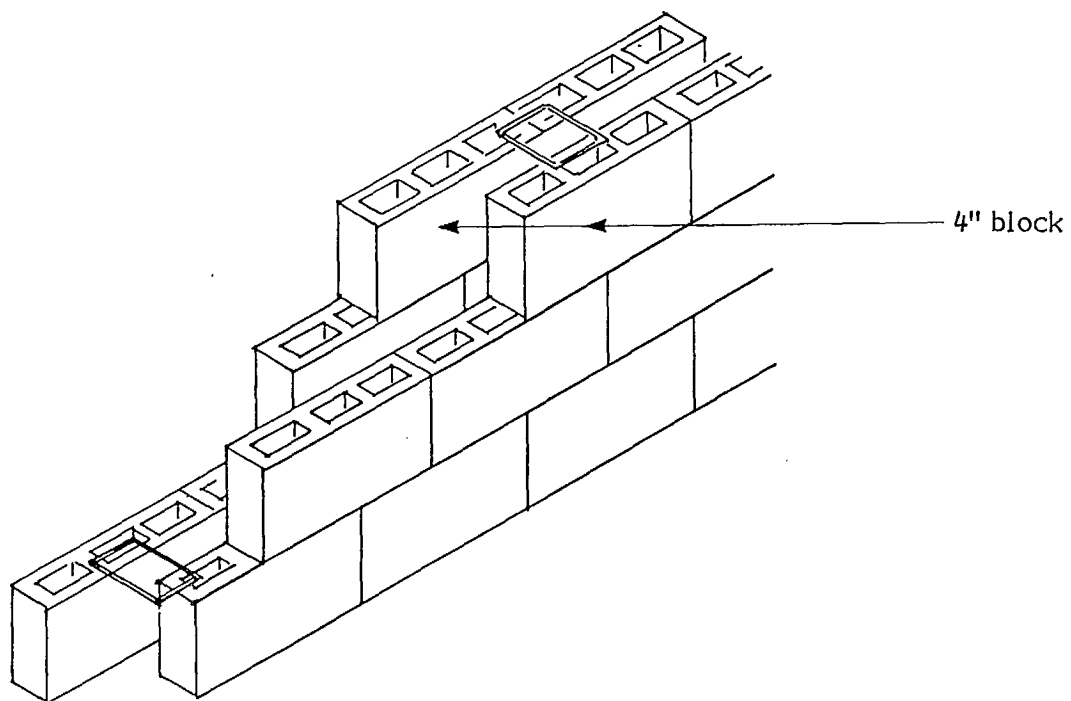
CONCRETE BLOCK CAVITY WALL
